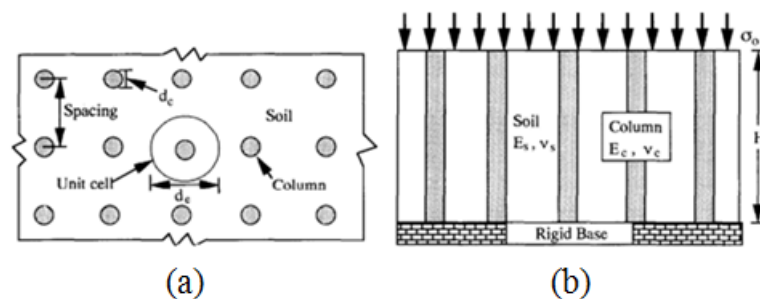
The foundation system to be analyzed: a) plan b) elevation (after Alamgir et al. 1996)
